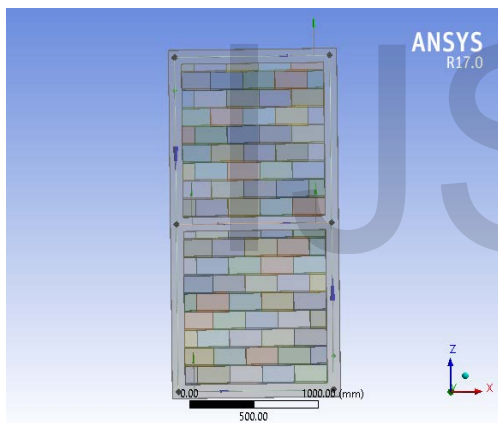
CAD model of frame infilled with linear groove interlocking blocks
